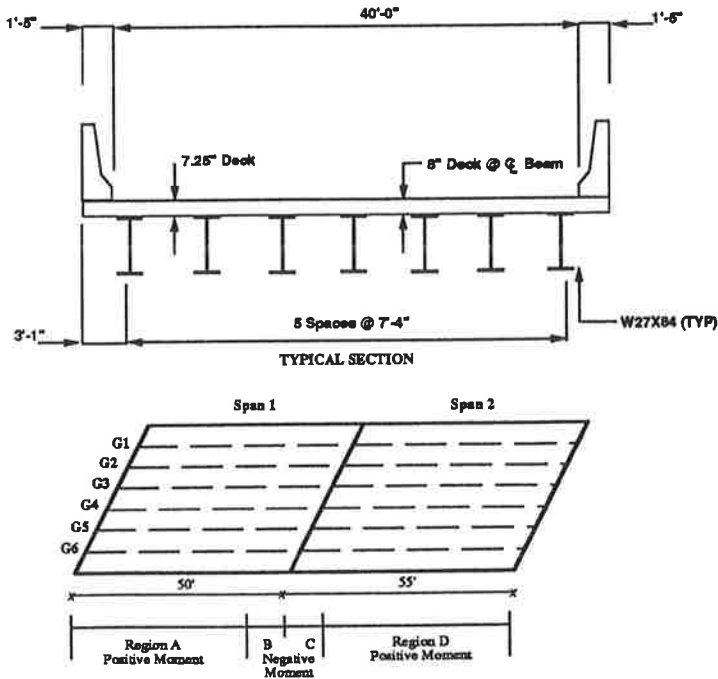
Typical Section and Plan View of Bridge Used For Numerical Example
